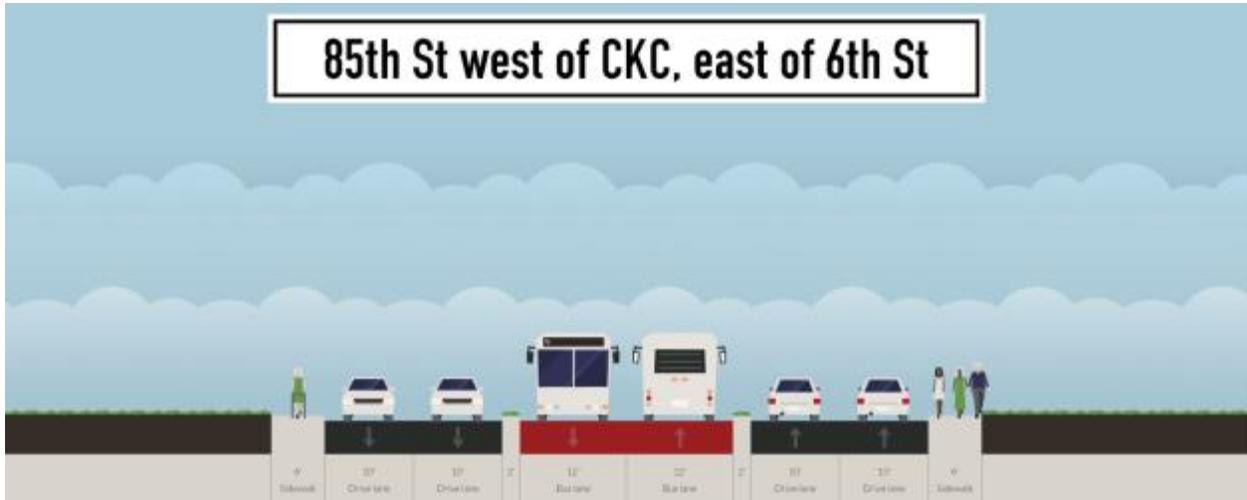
Full BRT treatments on NE 85th Street, between the CKC and 6th Street in Downtown Kirkland
